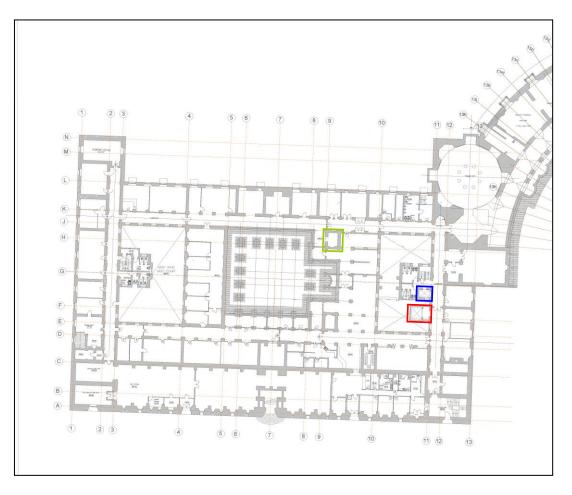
\_Union Buildings\_Overall Lower Ground Floor Plan\_Location of Lifts in West Wing (Source: Drawing Ikemeleng Architects, 2017)
